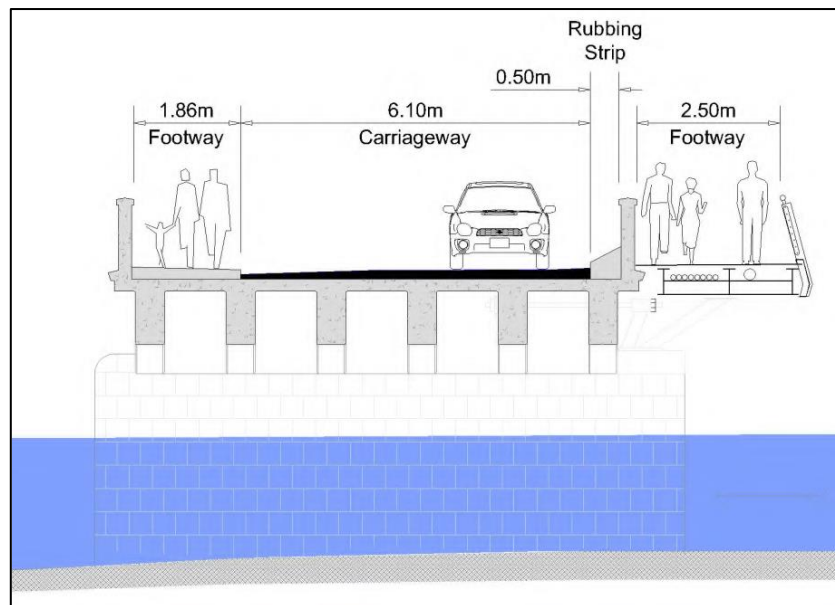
Existing Cross Section of Wolfe Tone Bridge (Facing West)⁴
